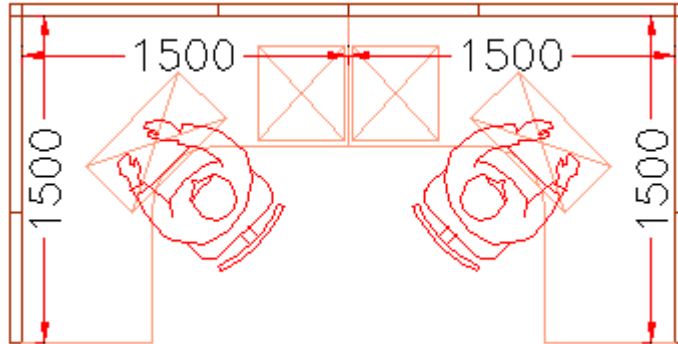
Typical Work Station Type "A" Dimension (2 seater)
